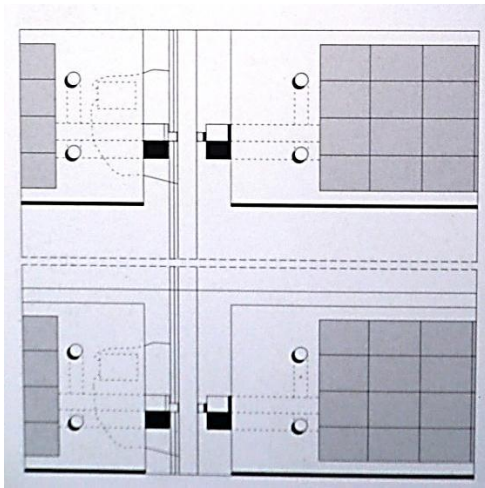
Wall section of the extension of Goethe School (Lüling, 2009).
